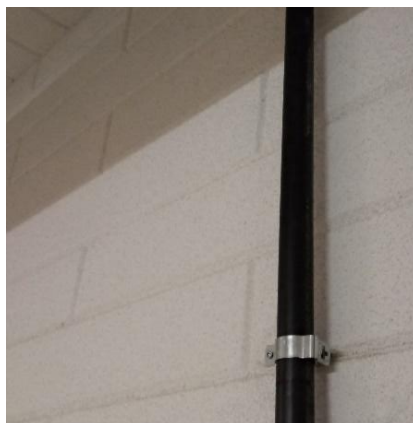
Fitting the Pluvia installation on traditional grips attached to the building structure
